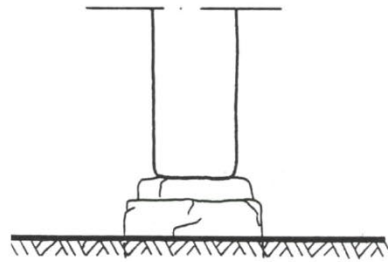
Walserhouse in Cresta (Rizzi 2003)
